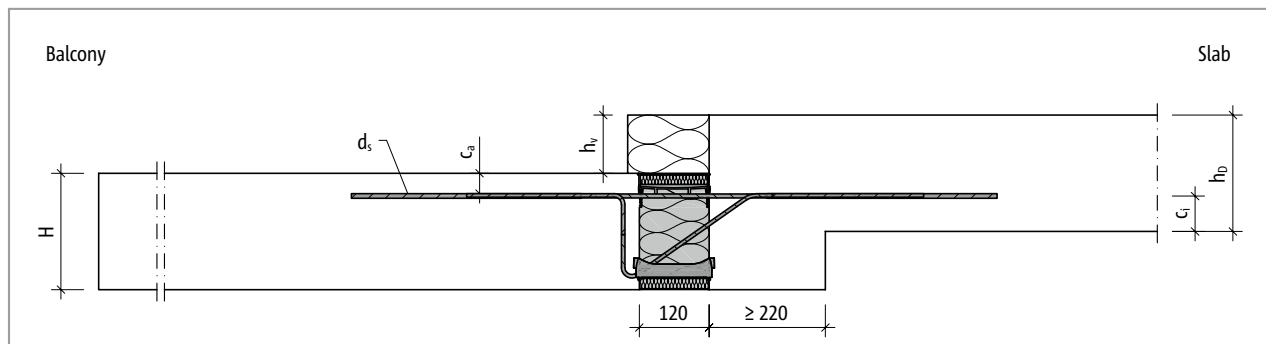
Schöck Isokorb® XT type K: Small height offset downwards (balcony adjacent)
